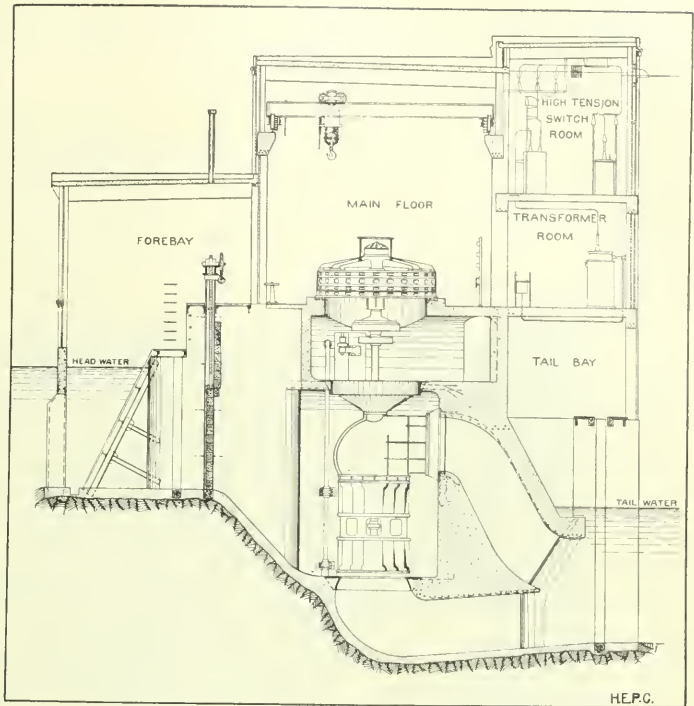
Waddell's Falls Development Cross Section through Power House.
